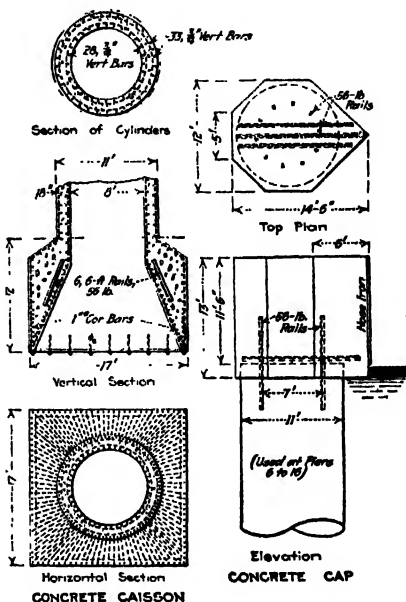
Reinforced Concrete Cylinder Caisson.
